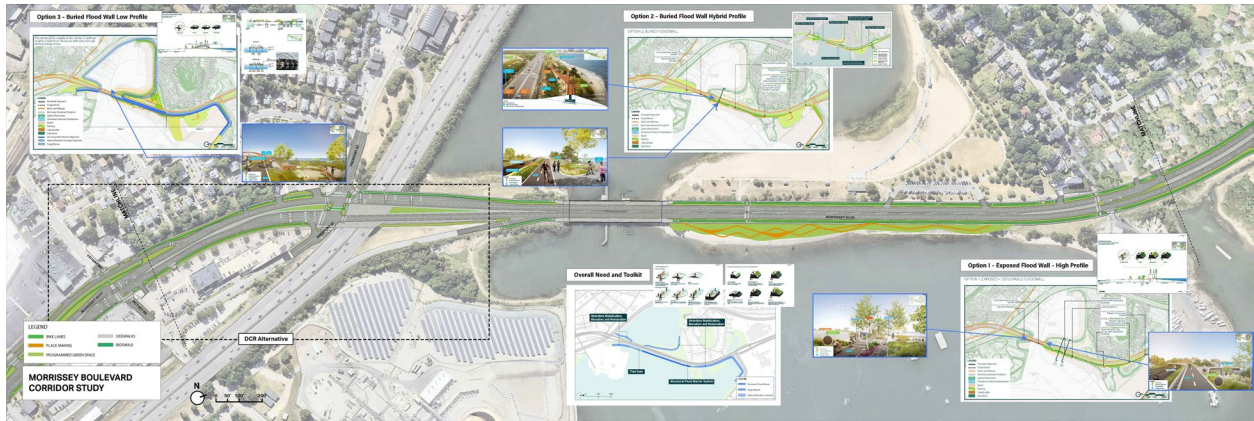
Corridor Layout from south of Bianculli Boulevard to Columbia Road
